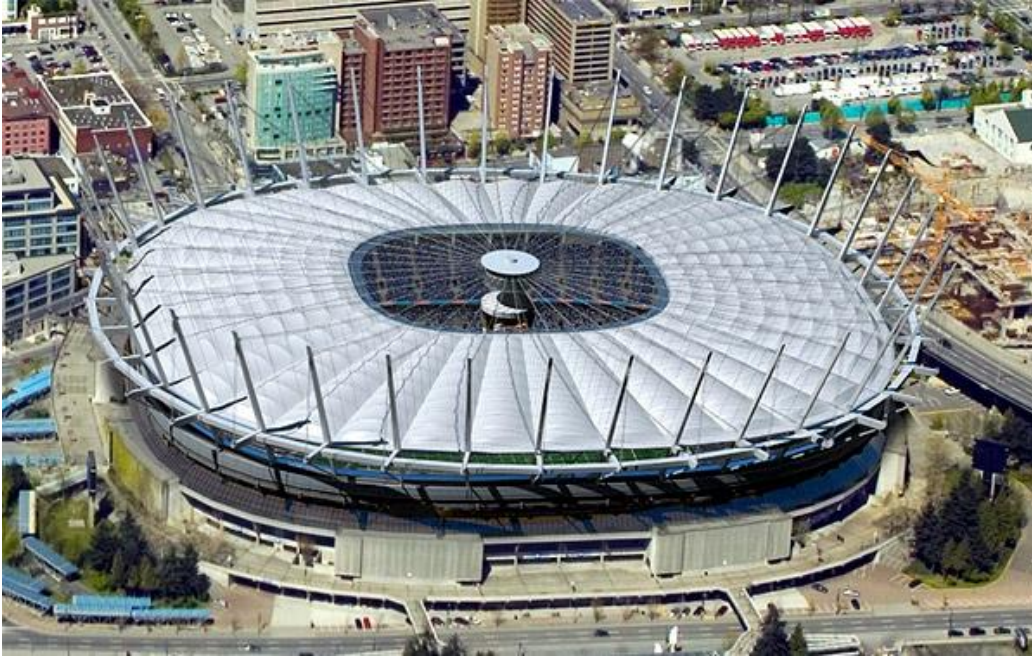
Rendering of the new BC Place fabric roof, with the centre portion retracted (Cygniak, 2011)
